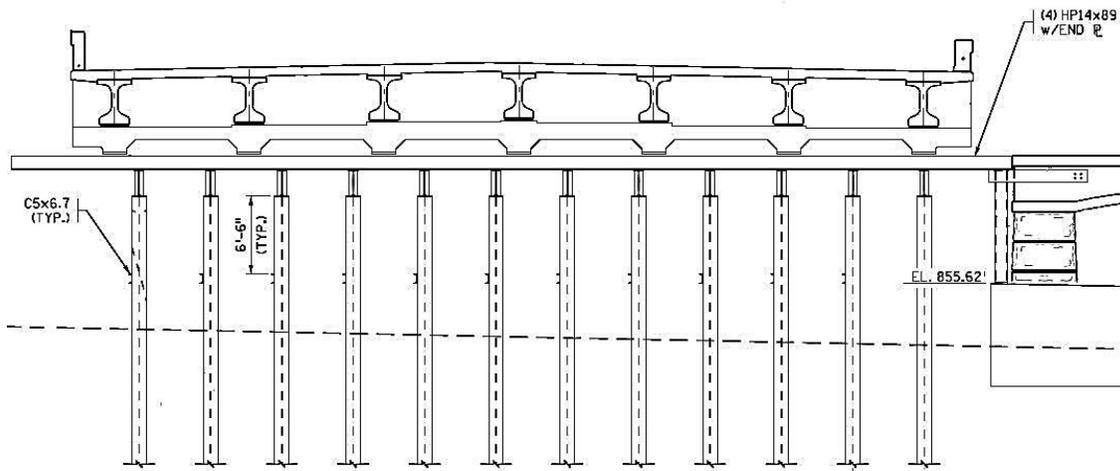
Side view of the Larpenteur Ave temporary pier substructure
